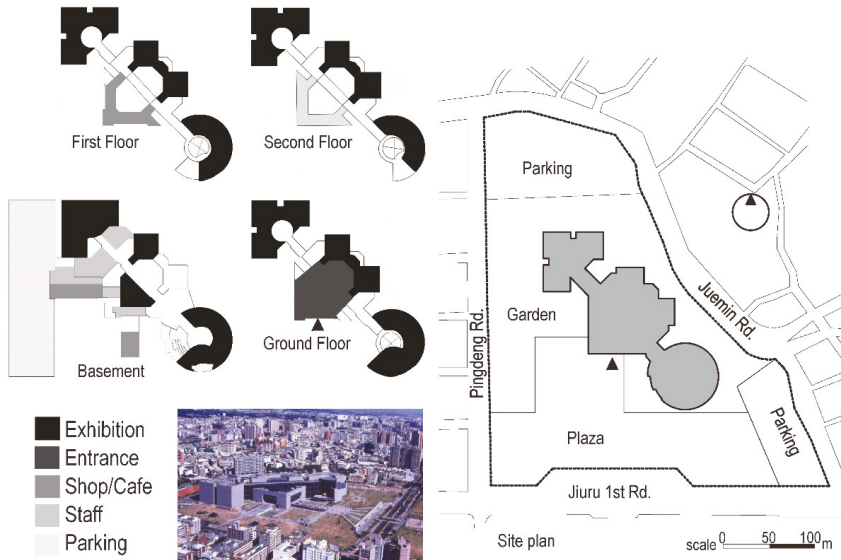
Site plan and major floor plans of the National Science and Technology Museum.
